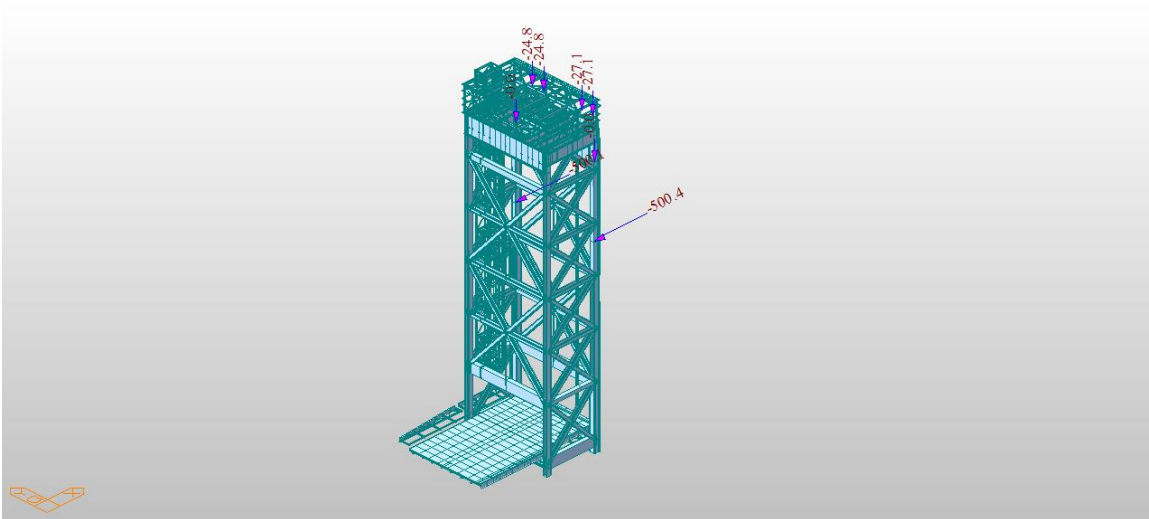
Wind Load Longitudinal 2 (North to South) – Bridge
